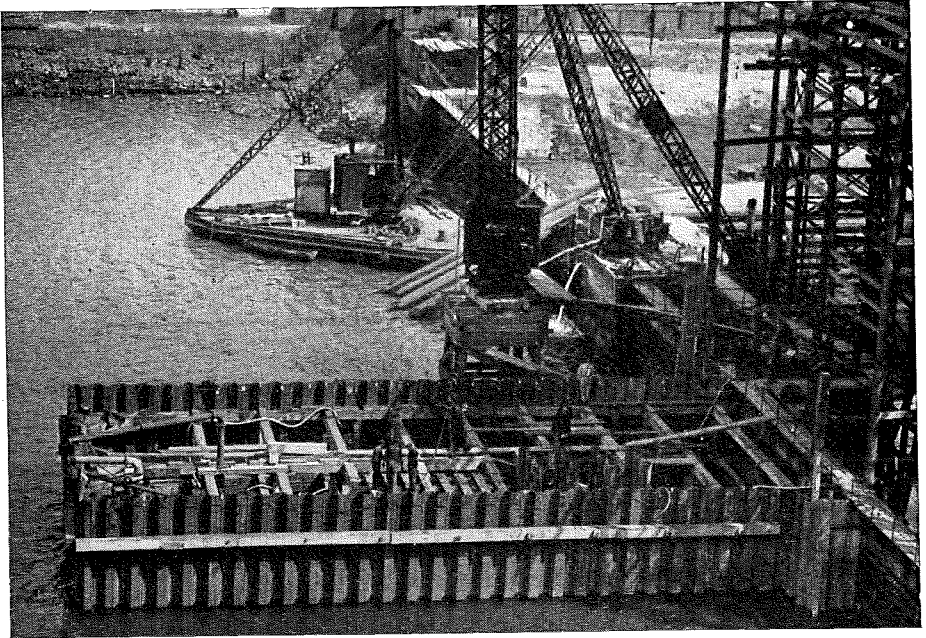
STEEL SHEET-PILED COFFERDAM WITH TIMBER BRACING.
